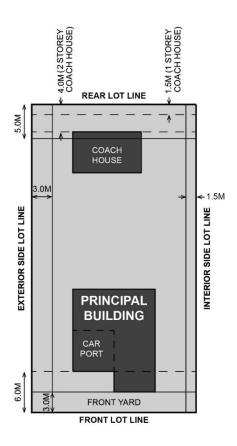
R1.0 Principal Building and SSMFH Coach House Setbacks.
